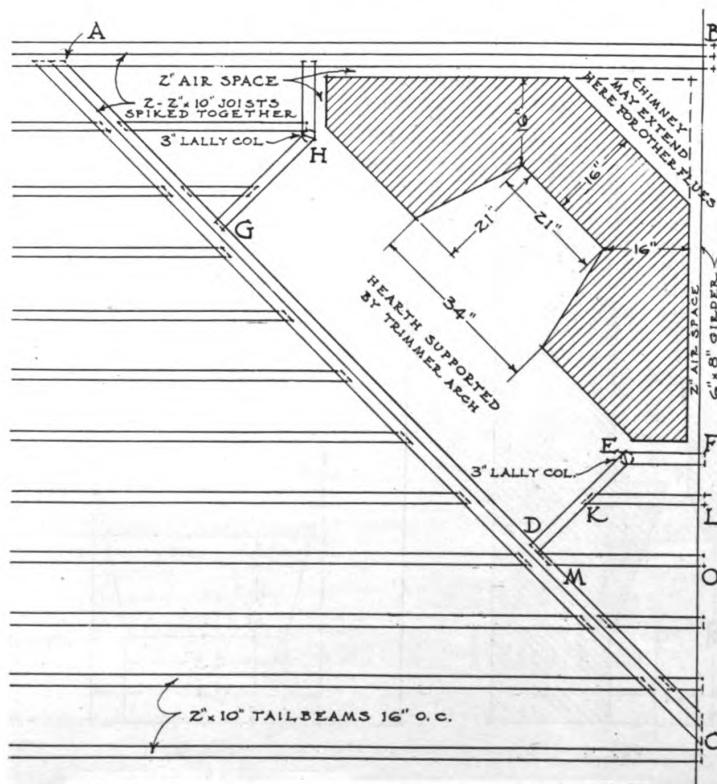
Framing of Timbers for a Fireplace Situated in One Corner of the Room
